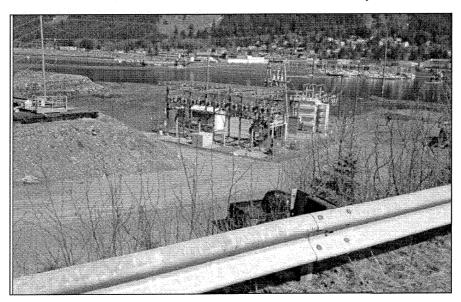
Picture taken from the Juneau-Douglas Bridge hillside looking down toward the electrical substation. Picture taken 4-29-13.
